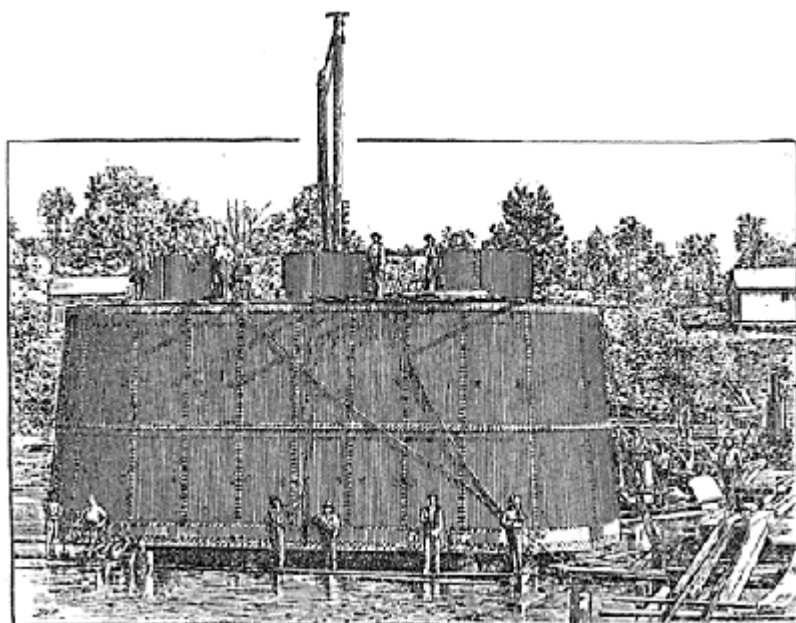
Cutting shoe of Hawkesbury Bridge caisson on launching ways (Engineering News, 1889a).
